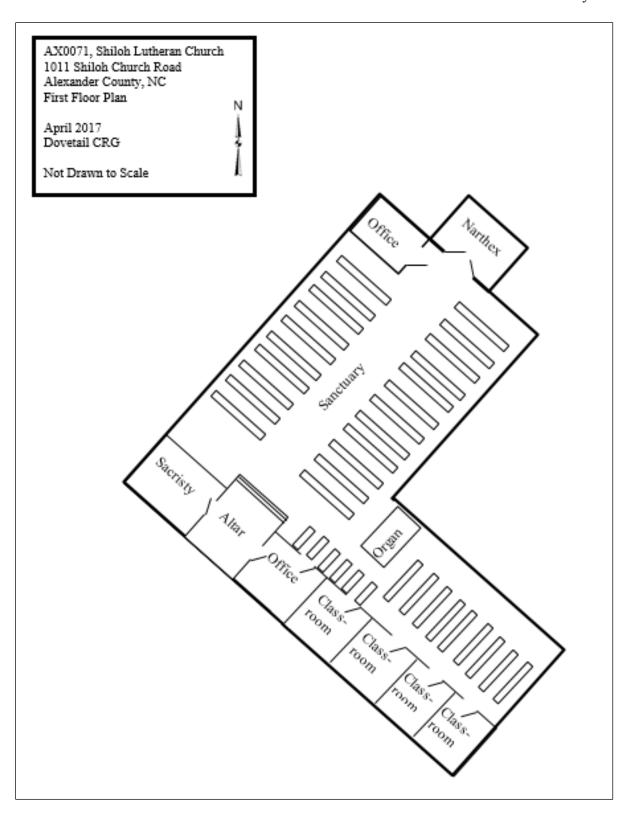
First Floor Plan of the Shiloh Lutheran Church (AX0071).
